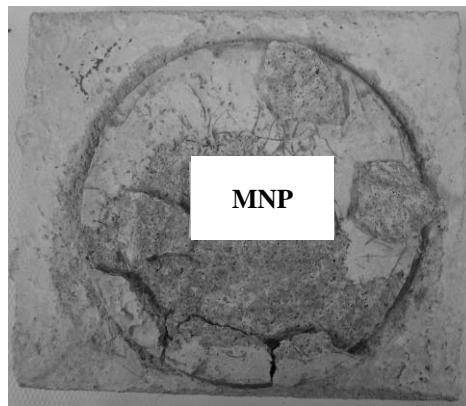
Example of spalling of sample made with 0.58% polypropylene fibre and w/c=0.4.
